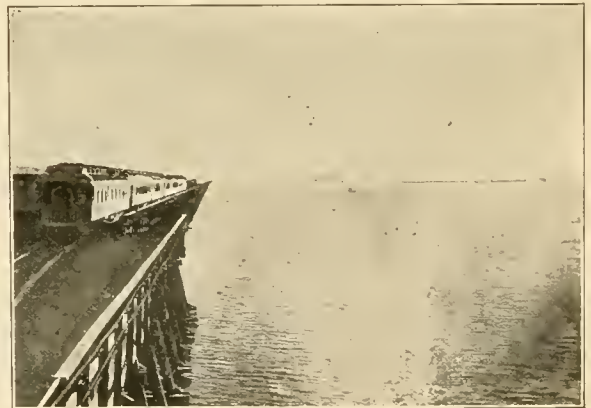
The railroad cut-off across Great Salt Lake. The lake is bridged by a single stretch of track fourteen miles long, built on piles driven into the sand beneath the water.
